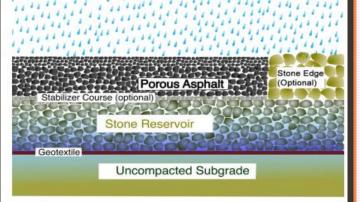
Typical porous asphalt pavement with stone reservoir cross section
